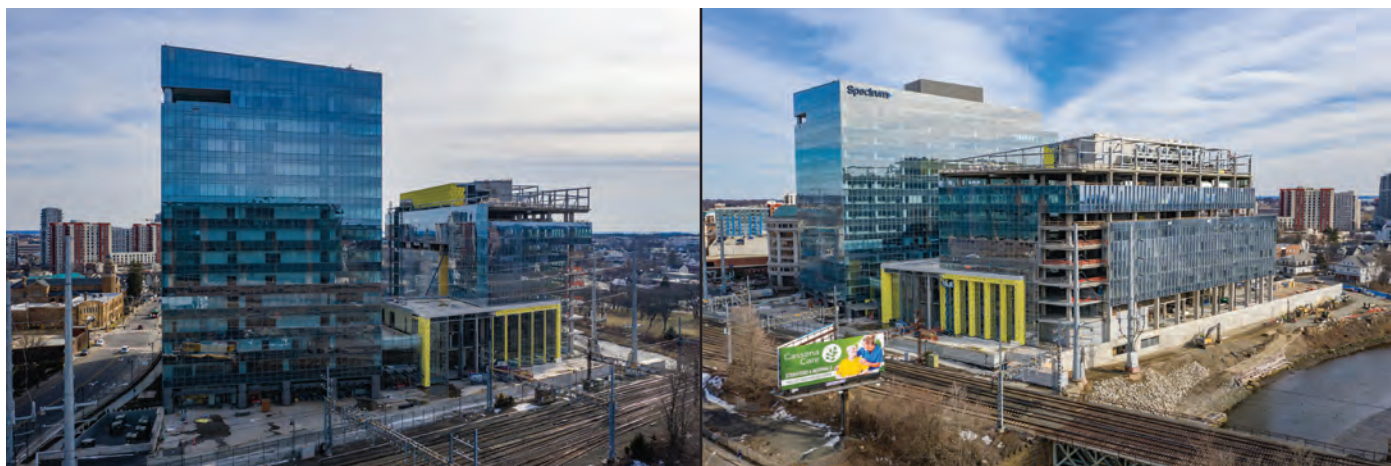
Gateway Towers 1 and 2 near completion (photos courtesy of Baker Concrete Construction)
